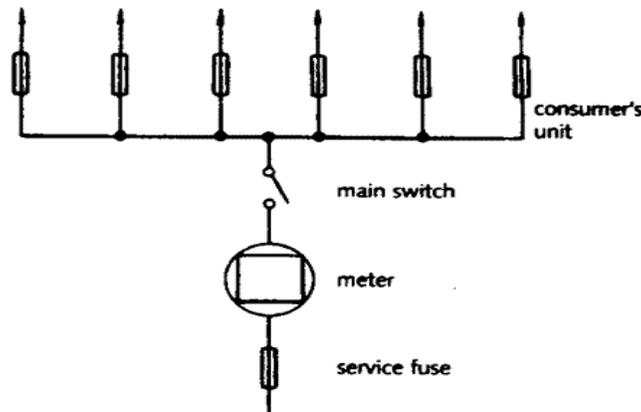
Typical arrangement for feeding final circuits in a residential installation
